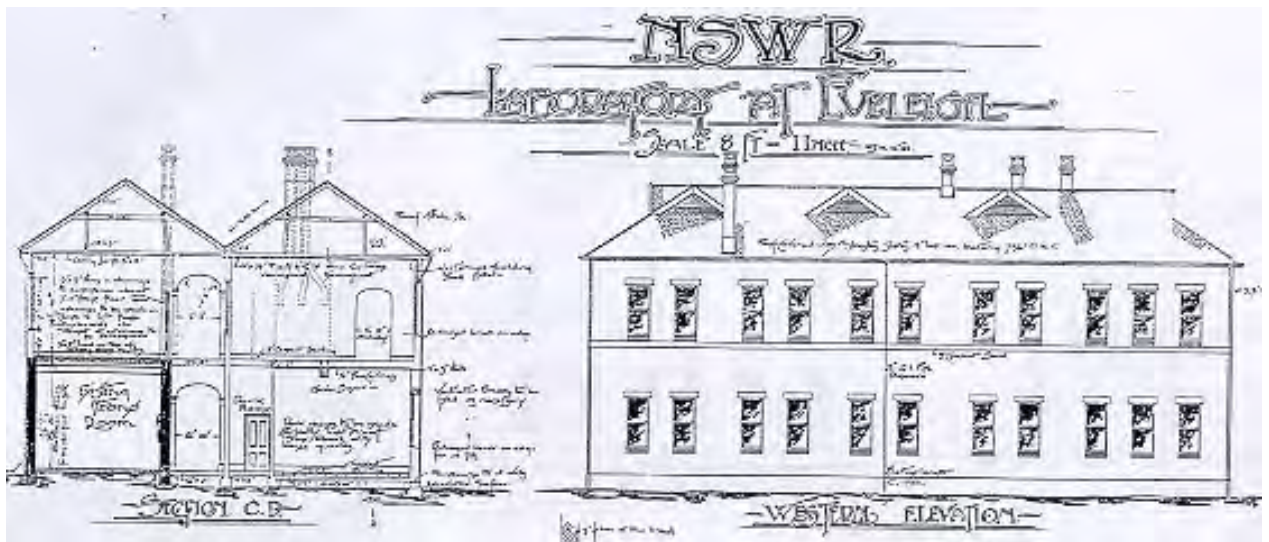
Construction drawing for the new laboratory at Eveleigh. Detail. Source: SRA Plan Room
